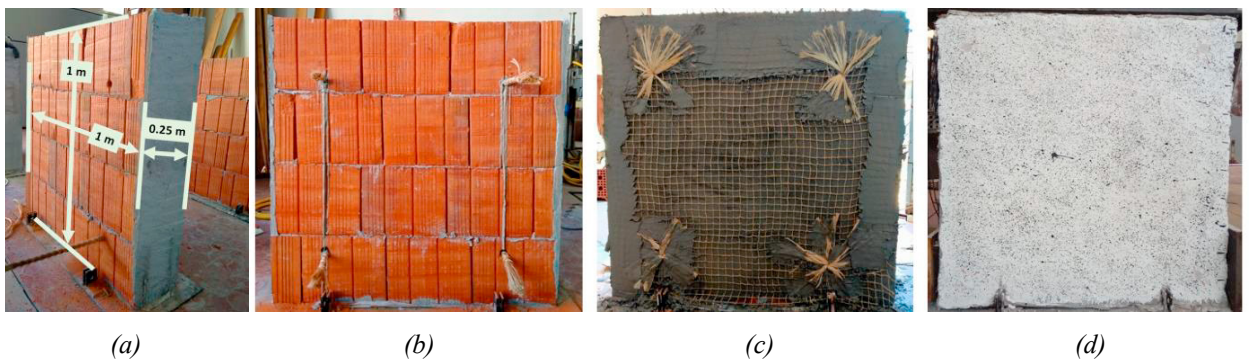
Masonry wall (1m x 1m x 0.25 m): (a) drilling holes of diatons, (b) diatons placement, (c) nets application, (d) Upgraded wall.
